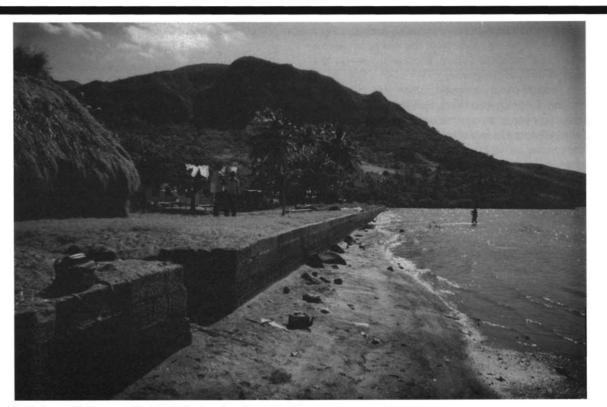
Vertical seawall of concrete blocks and land reclamation behind it.
